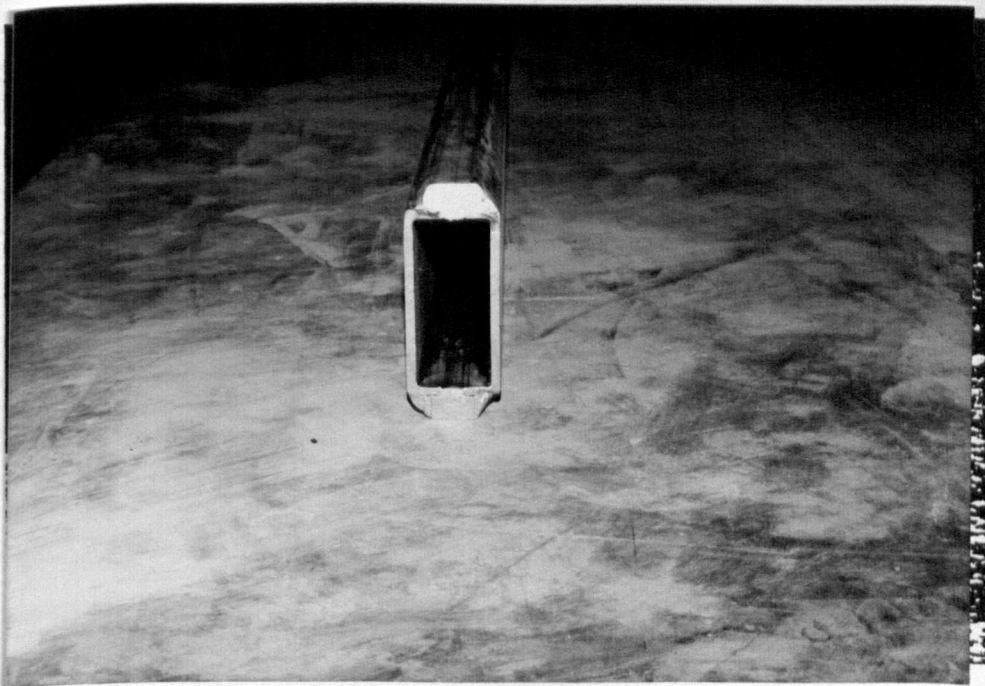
Fully Welded Beam (W-1000-F-1)
